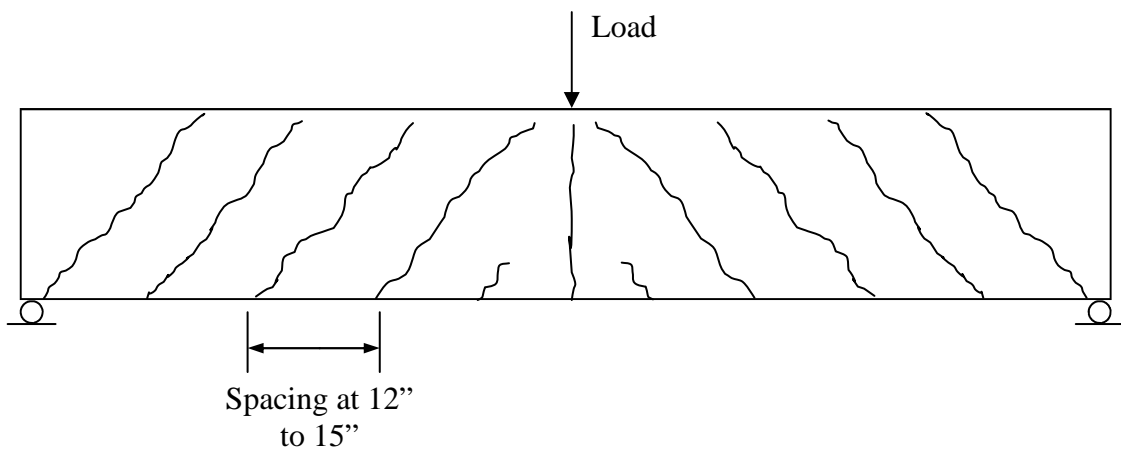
Crack pattern on convex side of beam at 17 kips (75.6 kN) during unloading for Beam B2A, loading #3
